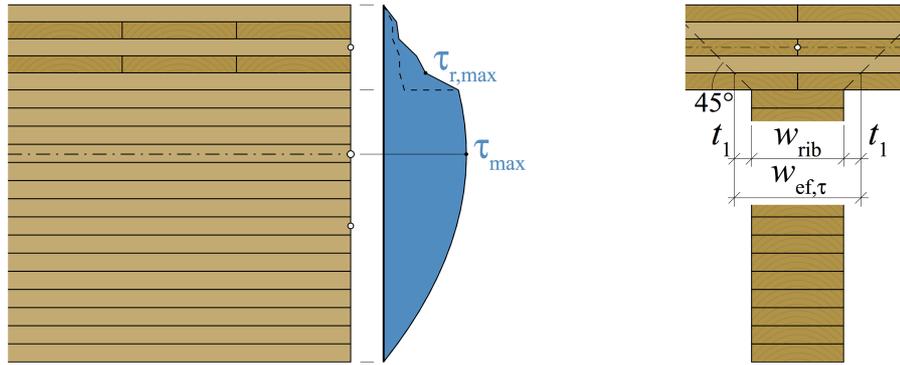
Shear stress distribution over a T-beam cross section (left); proposal in [44] for determining the effective width for calculation of (rolling) shear stresses in the CLT floor element above the rib (right).
